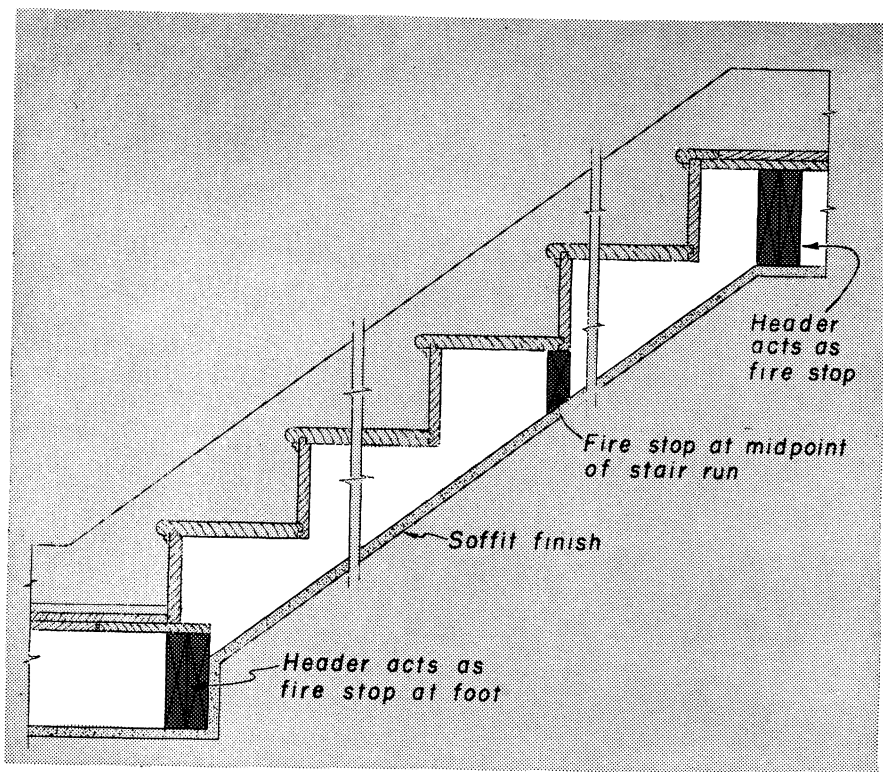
Fire-stopping at top and bottom prevents a stairway from acting as a flue to spread fire. A long stairway should also have a fire-stop midway in the stair run.
